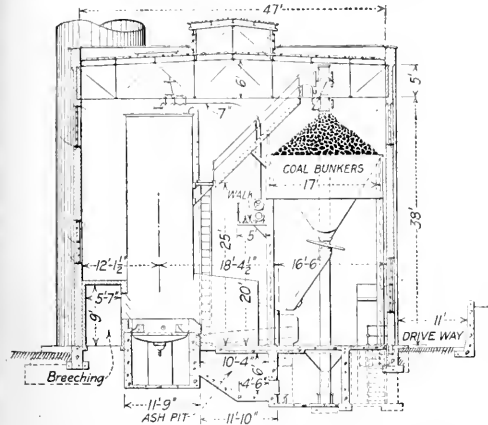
TRANSVERSE SECTION OF BOILER PLANT
